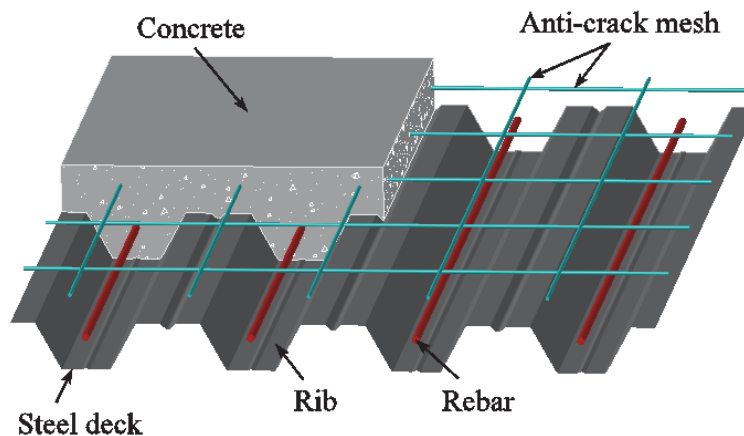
Typical layout of a composite slab with trapezoidal steel deck.
